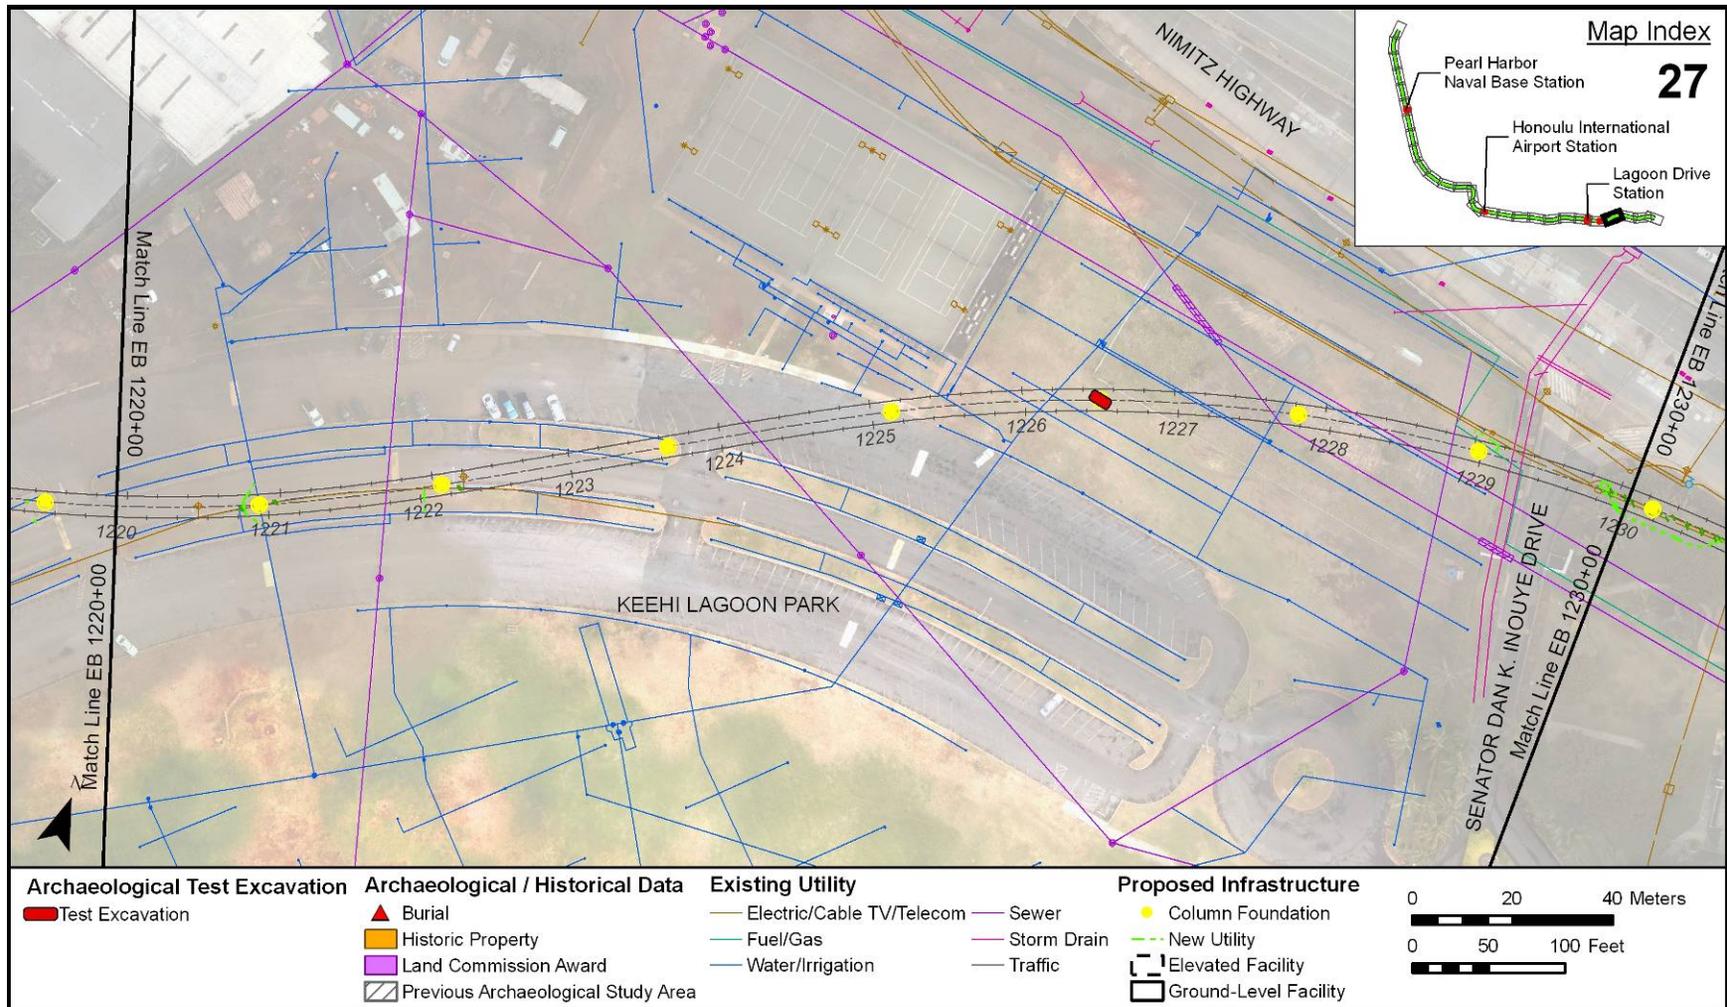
Map Sheet J 27, one 10x3 excavation at column foundation @ 1226+50
